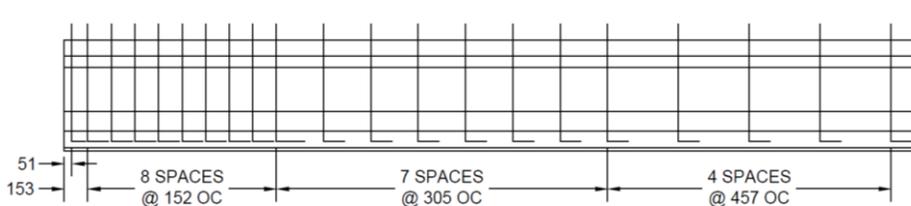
Mild Shear Reinforcing Layout and Spacing
